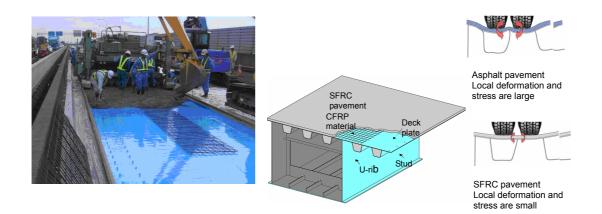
Fatigue durability improvement technology of existing steel floor slab using steel fiber reinforcement concrete (SFRC)
